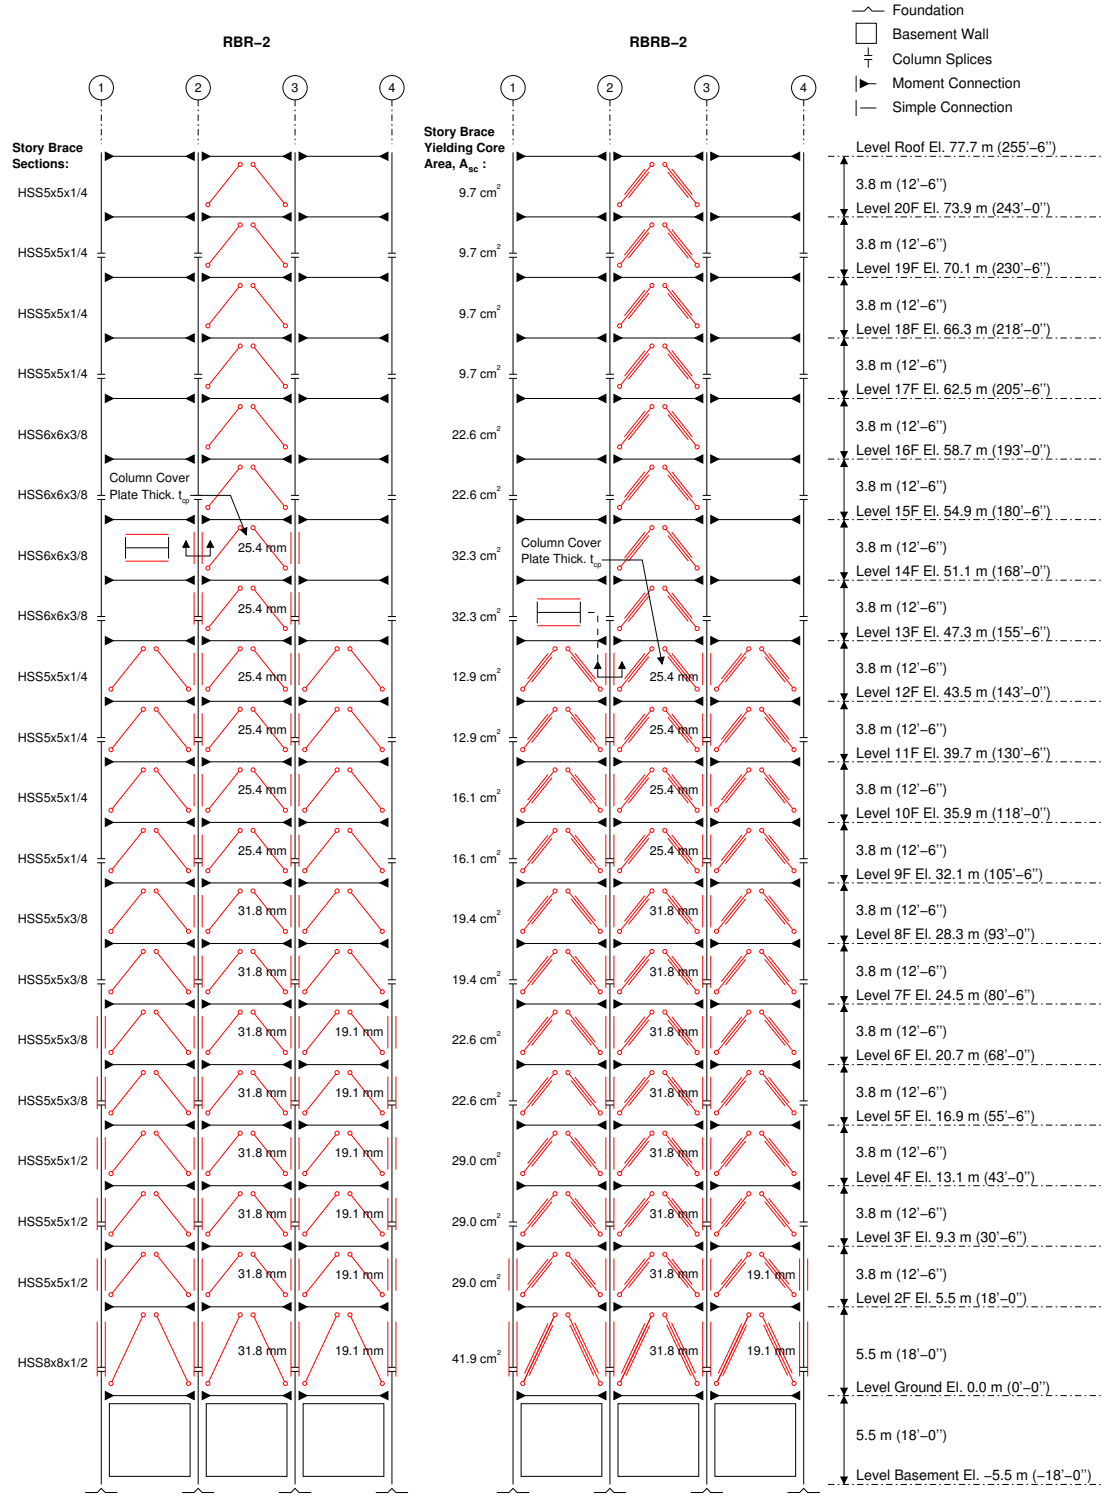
Elevation view of frames A of retrofit schemes RBR-2 and RBRB-2.
